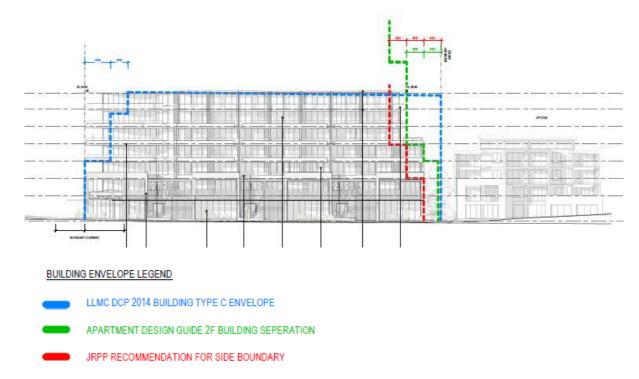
Setbacks at the southern boundary for The Esplanade tower
